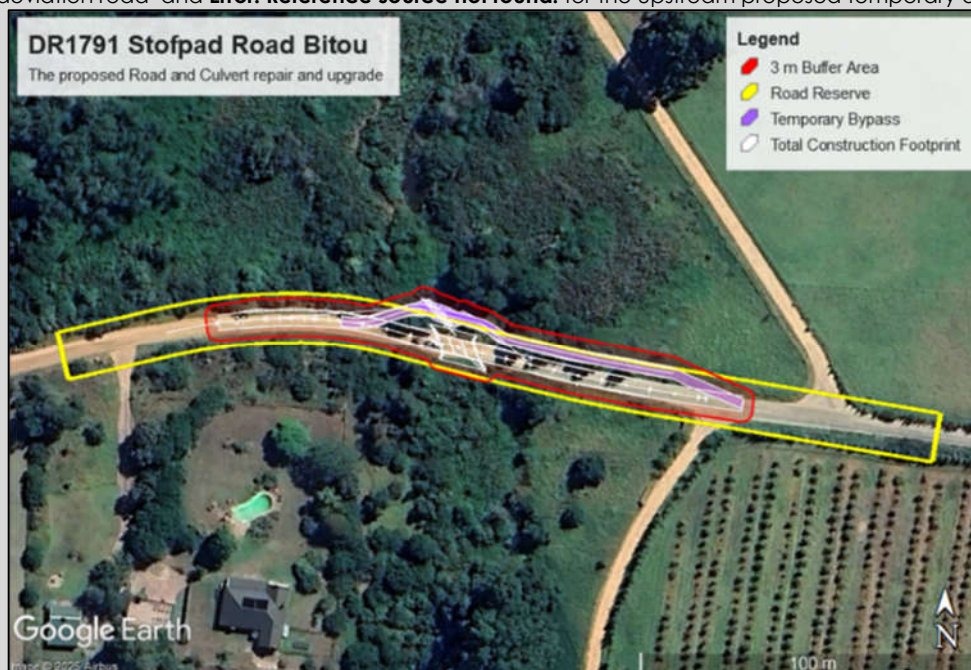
Proposed construction works of the temporary deviation road along DR1791, Witte drif (downstream).
